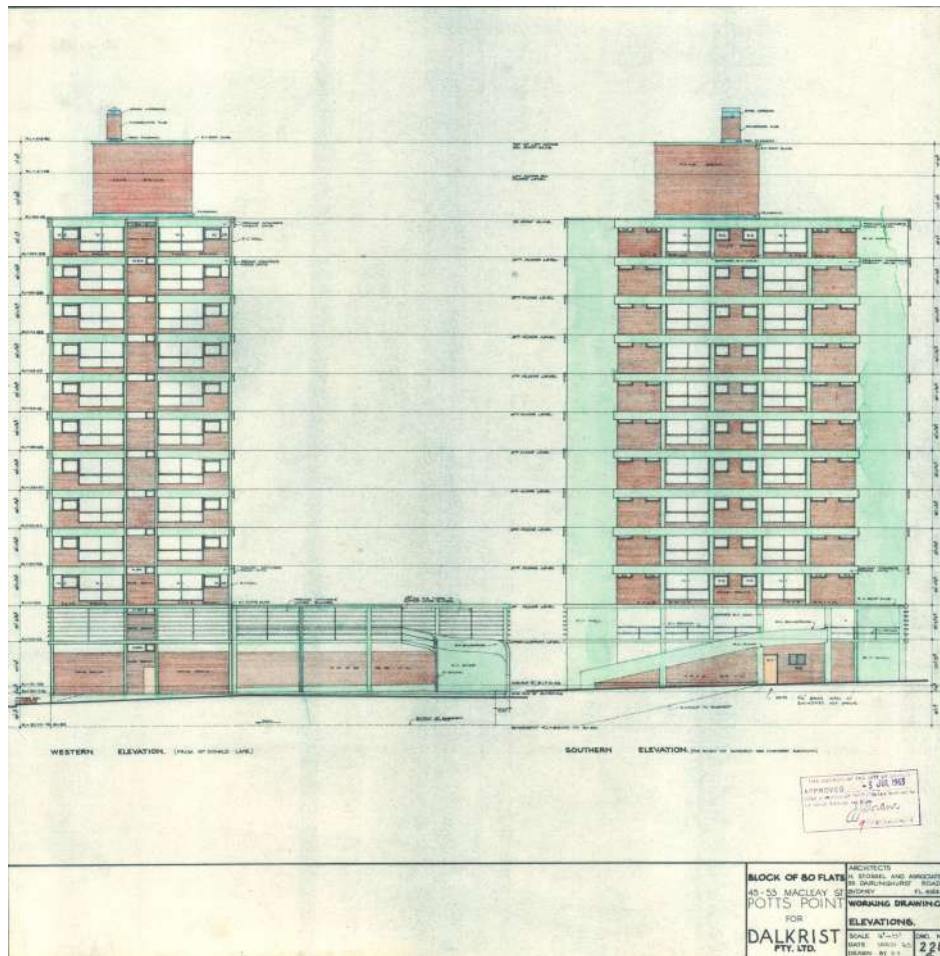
Plan of the elevations of the implemented design of March 1963 designed by Hugo Stossel for Dalkrist Pty Ltd
